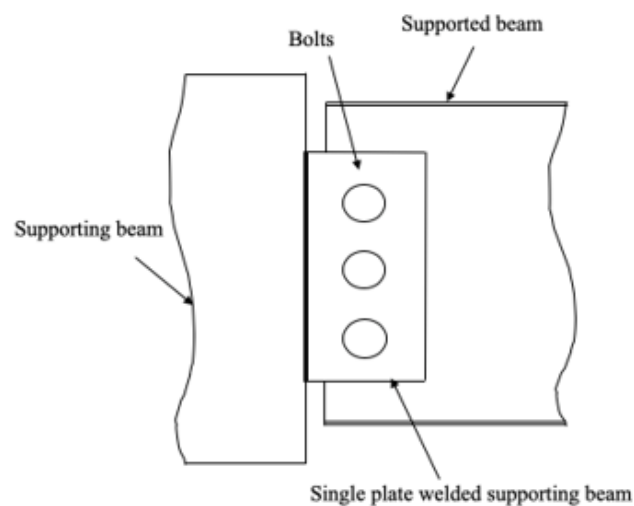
A Typical Beam-to-Beam with a Fin Plate Connection.
